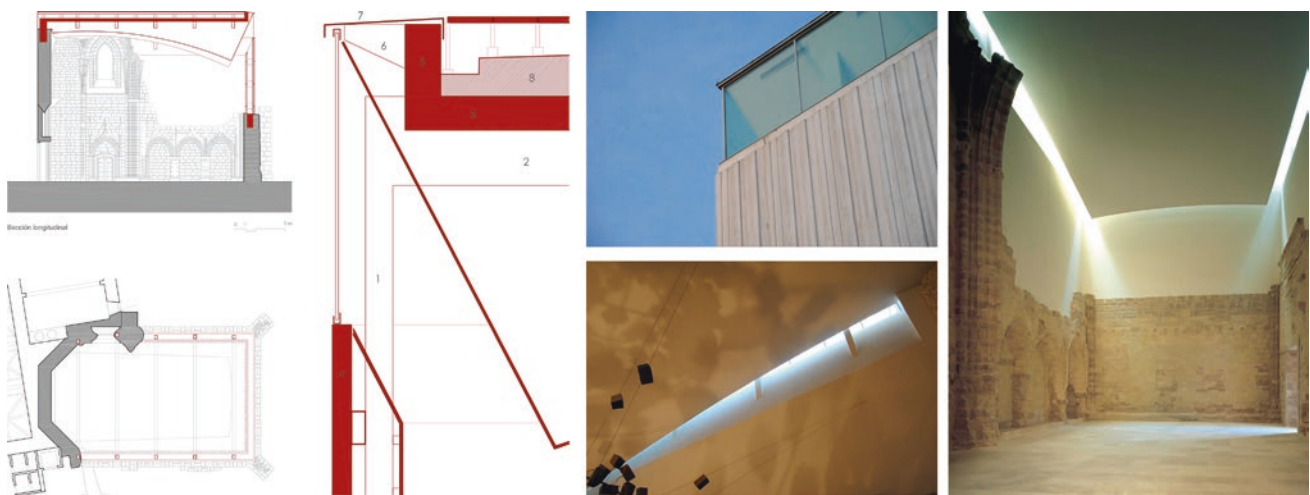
Plan, section, detail and pictures showing the construction system of the chapel; author's own, 2013. View of the chapel's interior space; Arnuncio (2007)
